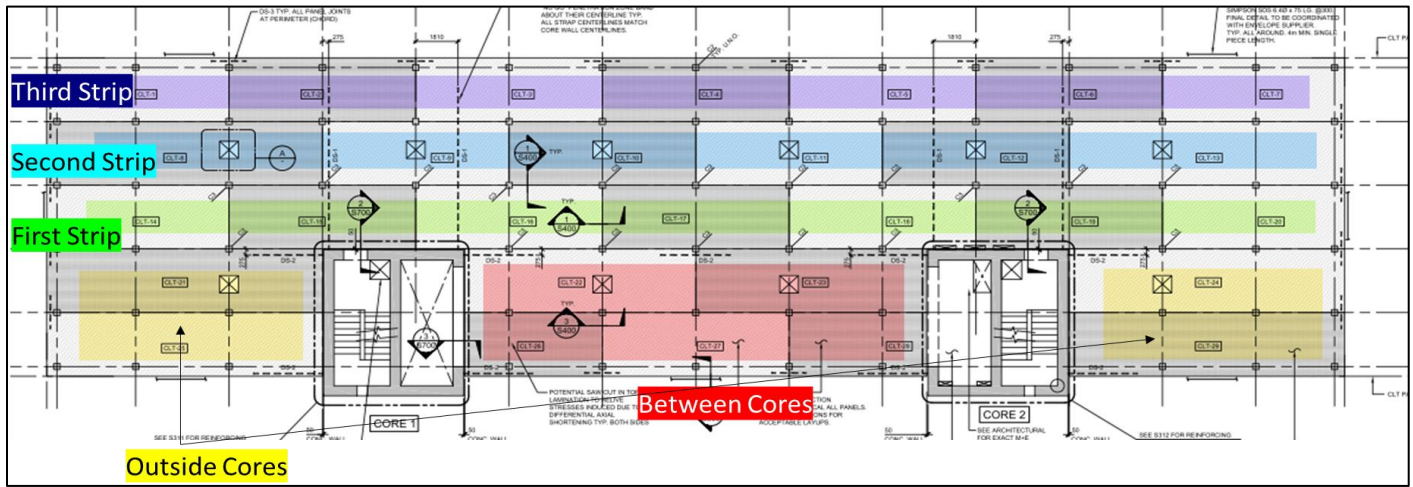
Typical CLT floor structural plan divided in four groups: between cores, outside cores, first strip, second strip and third strip (courtesy of Fast+ Epp)
